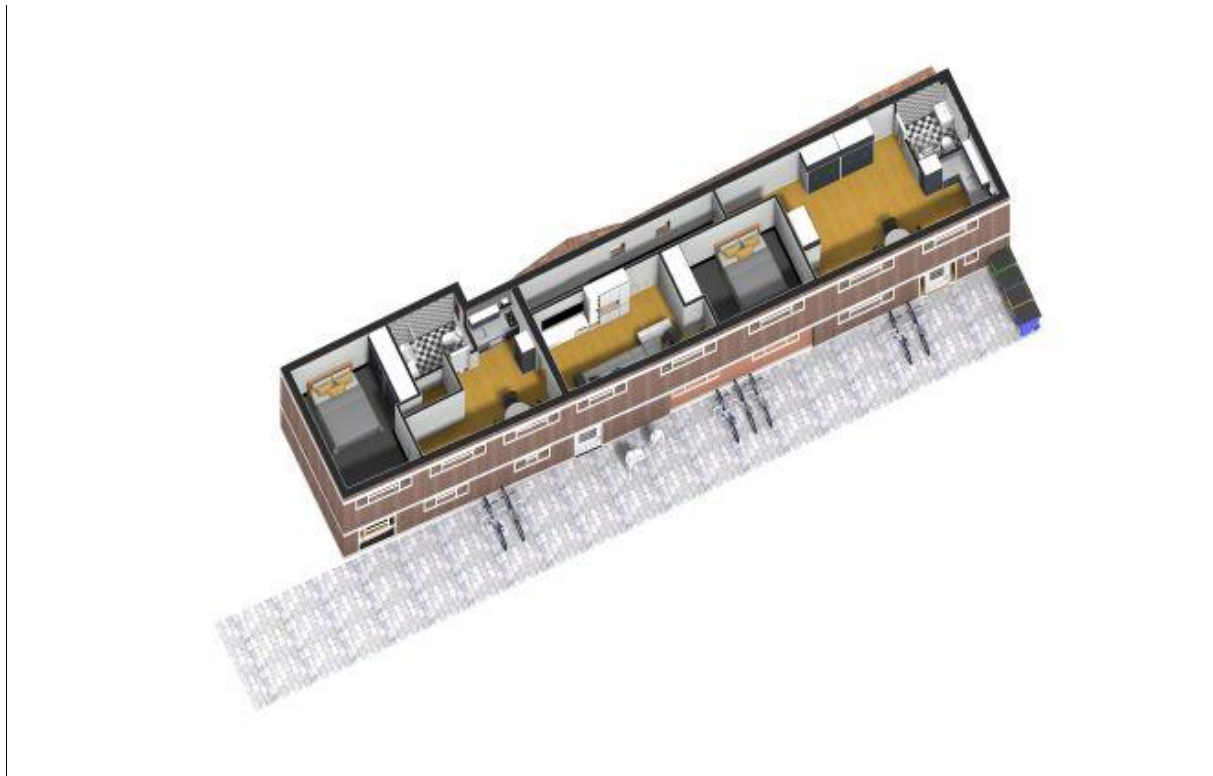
Proposed First Floor – Flat 3 & 4 (3D)
